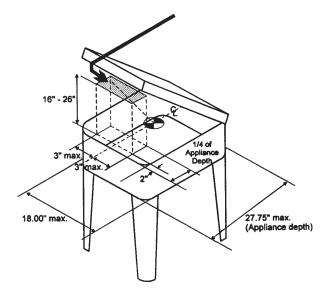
Model NL-FL2 Nozzle Placement, Tilting Skillet/Braising Pan.
